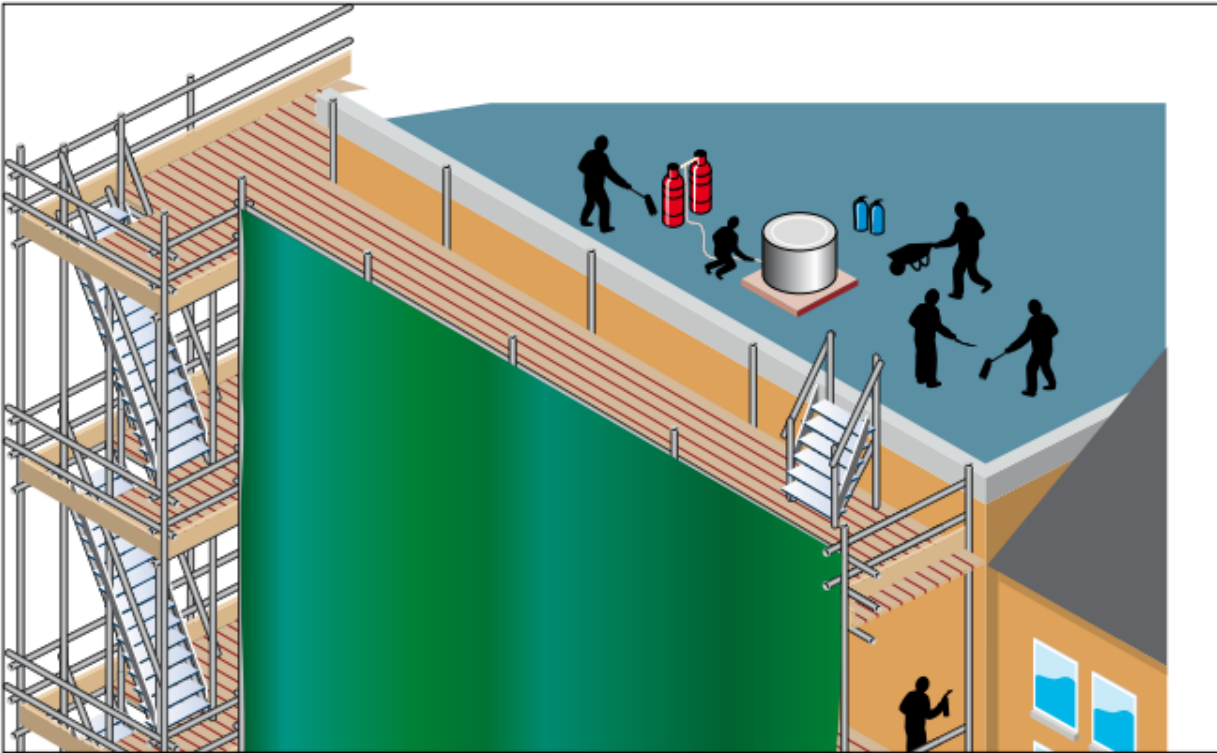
In this job, hot work on the roof and window renovation using blowlamps and substantial amounts of flammable substances mean the fire risk is high. Escape via ladders inside the sheeting could be difficult so external access is provided at one end. Some scaffold components have been omitted for clarity, eg roof edge protection is required. The escape route should lead away from the enclosure, where possible
